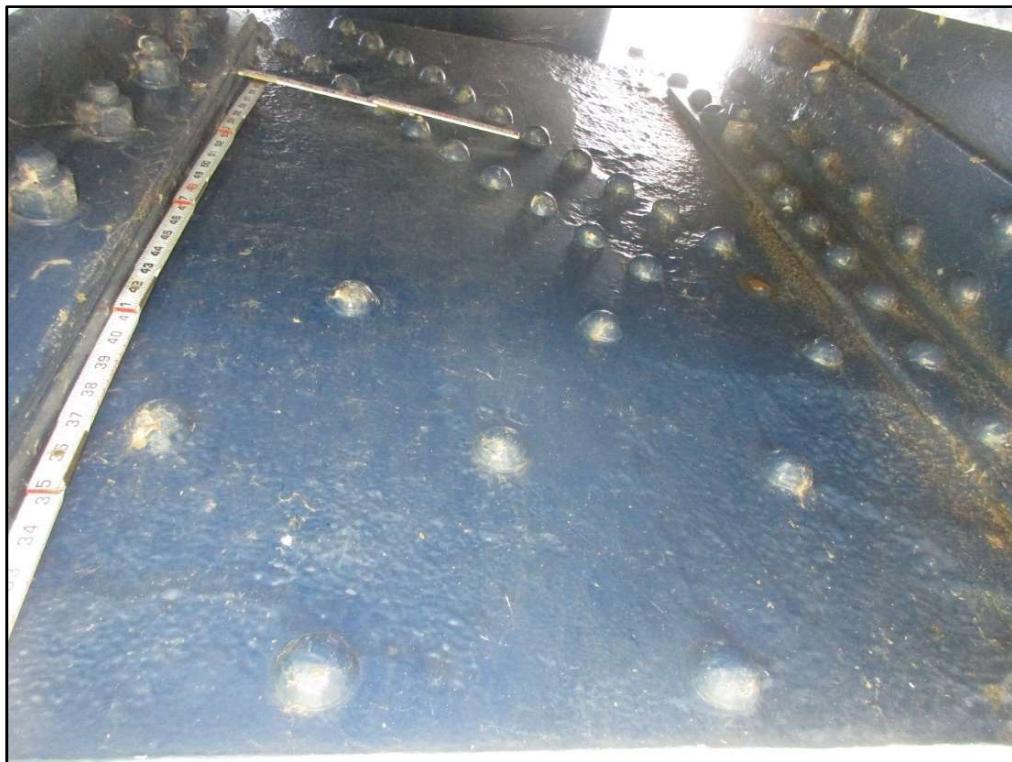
Pitting with Perforations, L6 South Interior Gusset Plate
